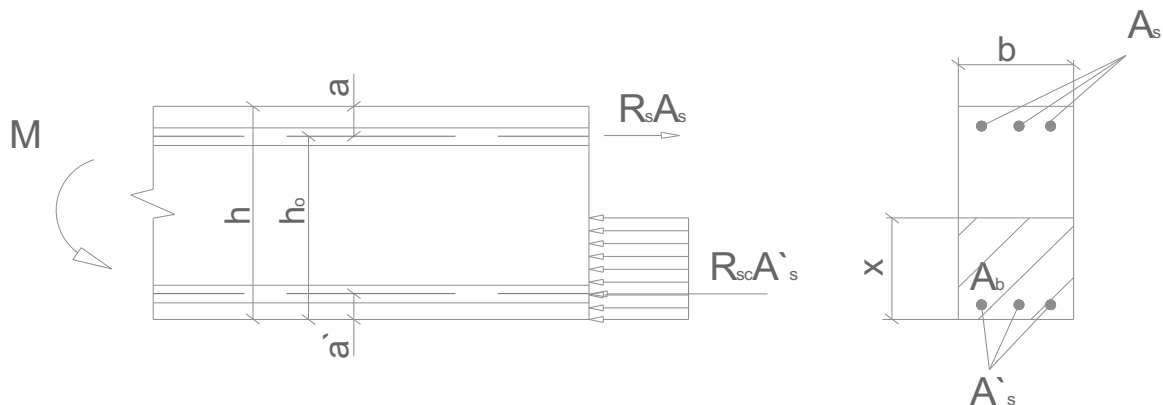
Scheme of forces in a transverse rectangular cross-section of a bended reinforced concrete element
